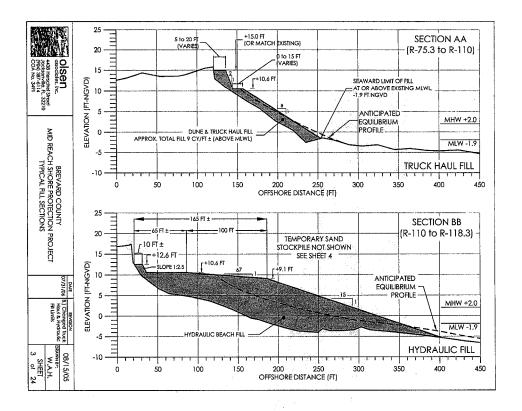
Local Option 1, Reach 6 – Typical Truck Haul Dune Fill Cross Section (top) and Reach 1- Typical Conventional Hydraulic Fill Cross Section (bottom)
